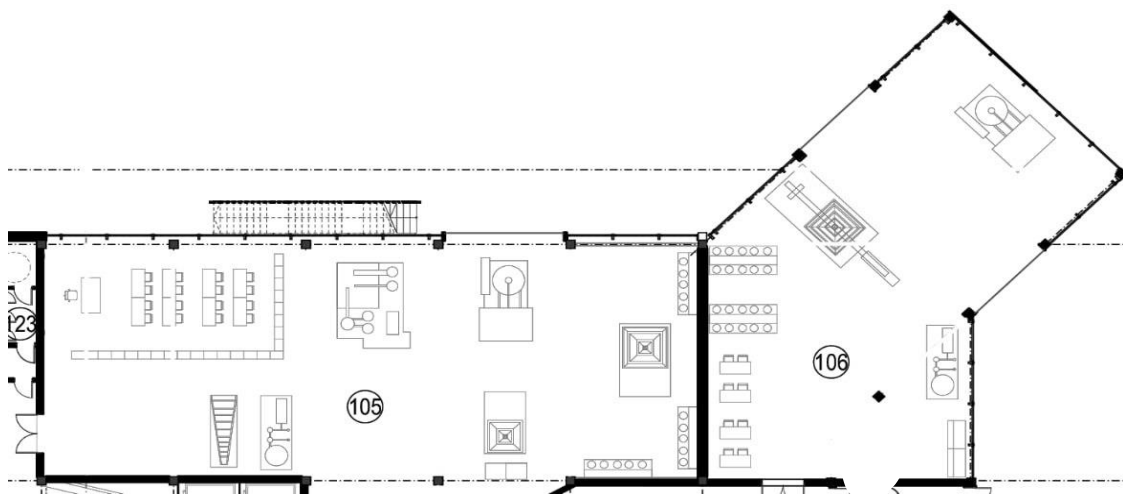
Floor plans of the workshops in Building 7 [made by the authors]
